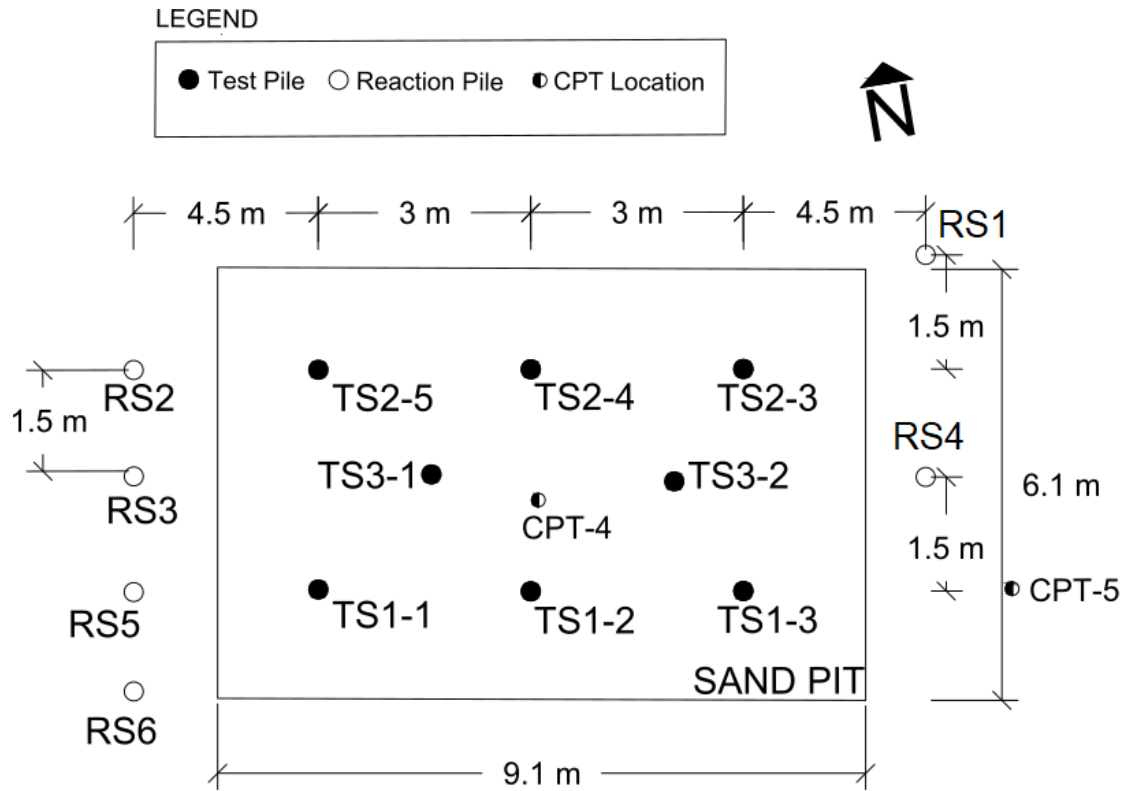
Granular soil site layout: test piles, reaction piles, and site investigation locations.
